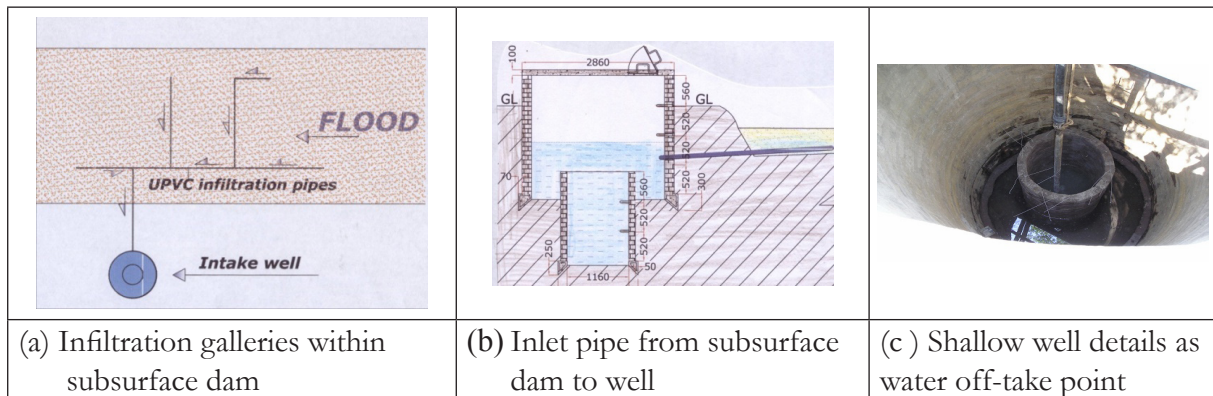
Arrangement of water draw-off from a subsurface dam
